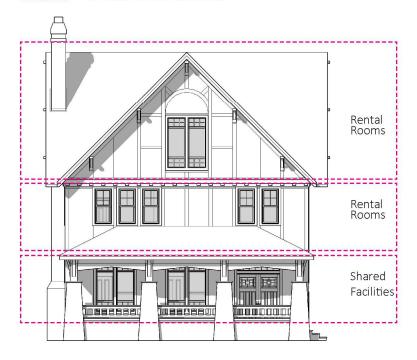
R-3 ZONE Single Room Occupancy (Subject to 4.32)Example
